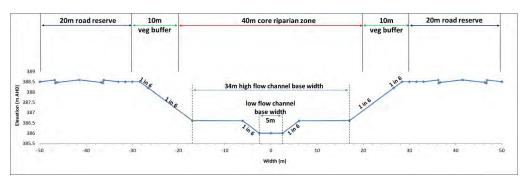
Conceptual arrangement of a typical cross section for a 60m wide waterway corridor
